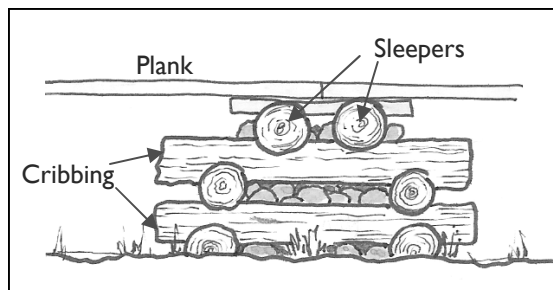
Bog Bridge with Sleepers, or Single Plank Boardwalk
